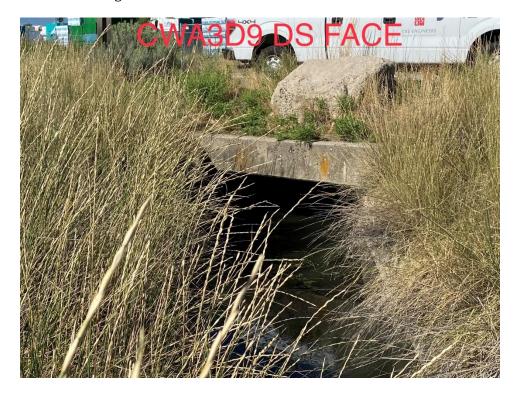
Looking upstream at CWA3D9 Swaner Rd. 11.5-ft wide culvert.
